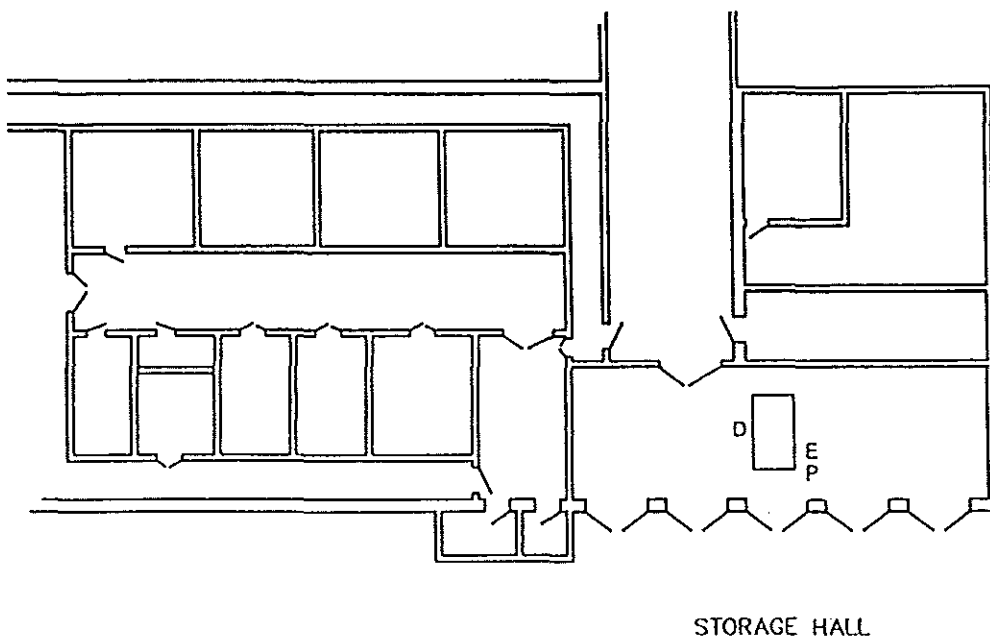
Layout of CLAB showing positions D, E and P in the storage hall.
